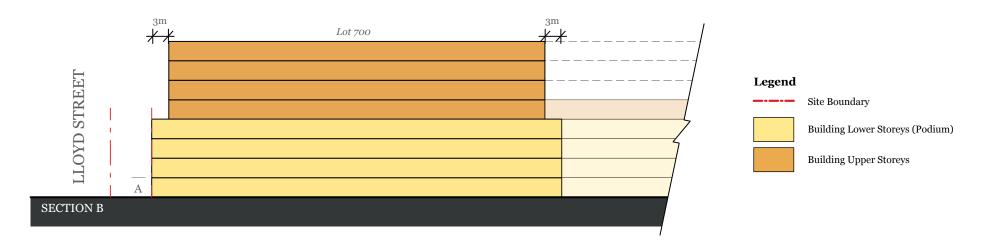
LOTS 700 & 8030 CLAYTON STREET SECTIONS
